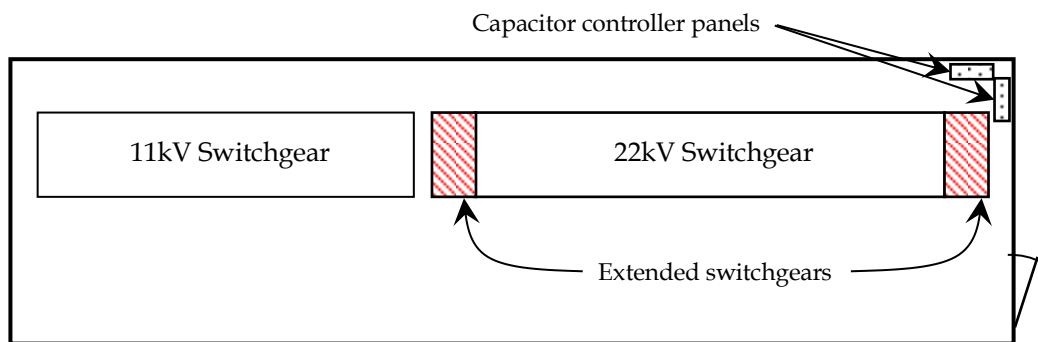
Layout image of MV Switchgear room in Central Hurghada S/S
